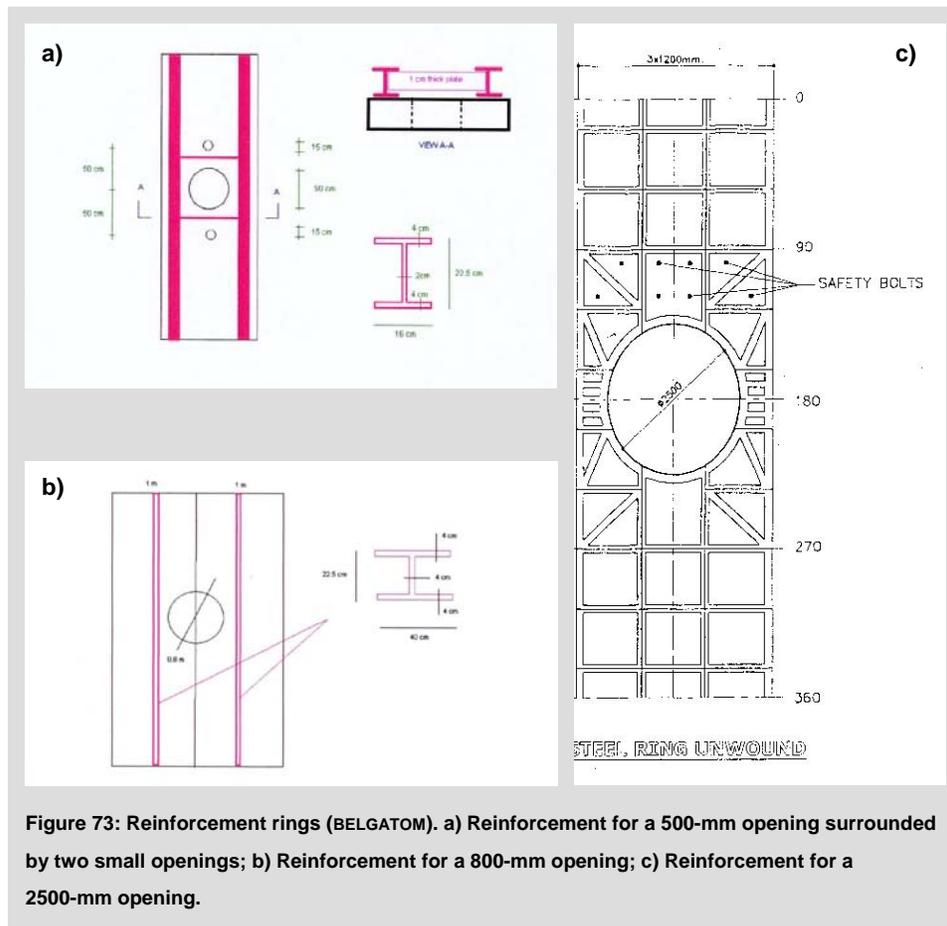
Reinforcement rings (BELGATOM). a) Reinforcement for a 500-mm opening surrounded by two small openings; b) Reinforcement for a 800-mm opening; c) Reinforcement for a 2500-mm opening.
